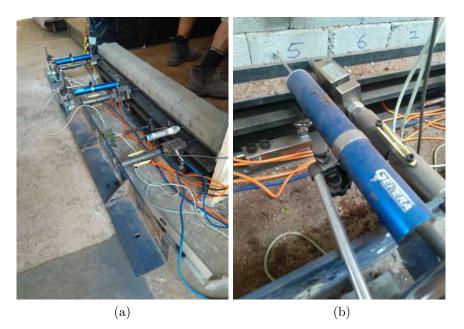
Instrumentation used to measure horizontal toe loads and horizontal toe displacements, with S-shaped load cells and strain-gauge based displacement transducers: (a) front view; (b) detail, showing displacement transducer and horizontal load cell arrangement.
